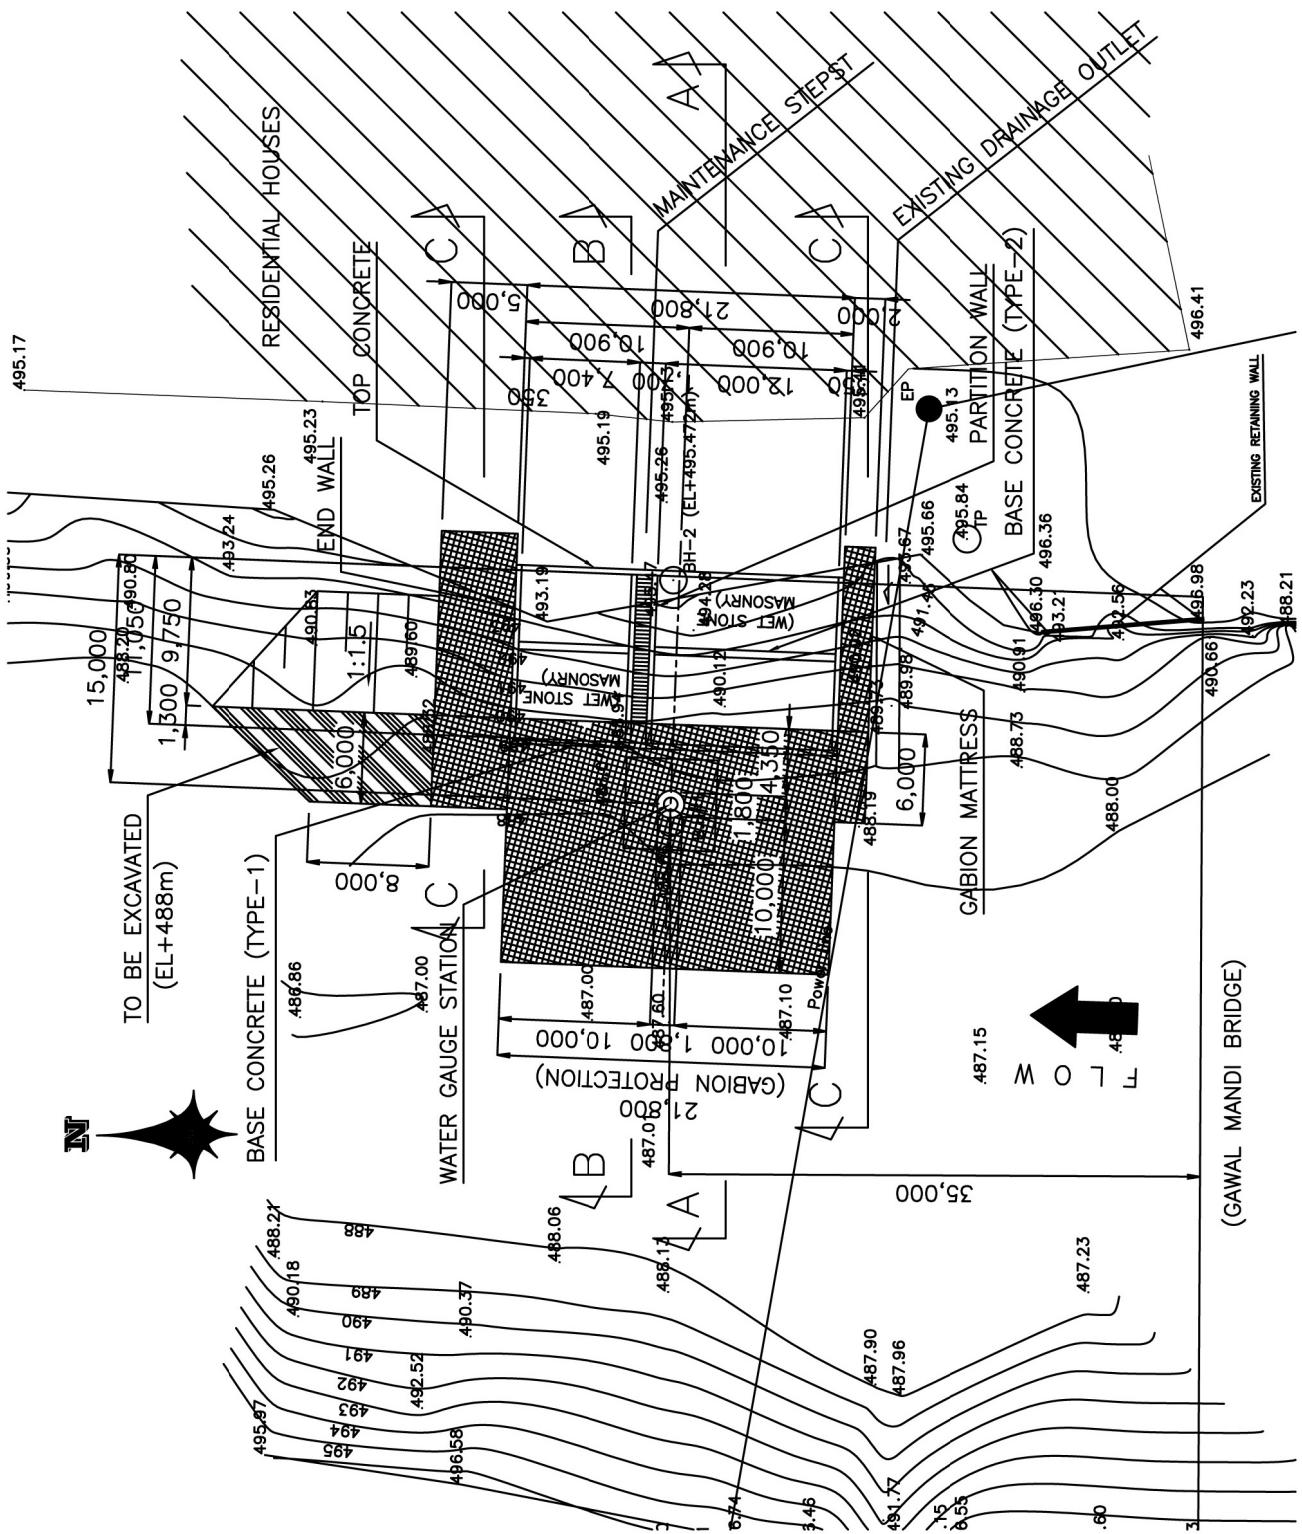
Layout Plan of Water-level Gauging Station (Gawal Mandi Bridge)
